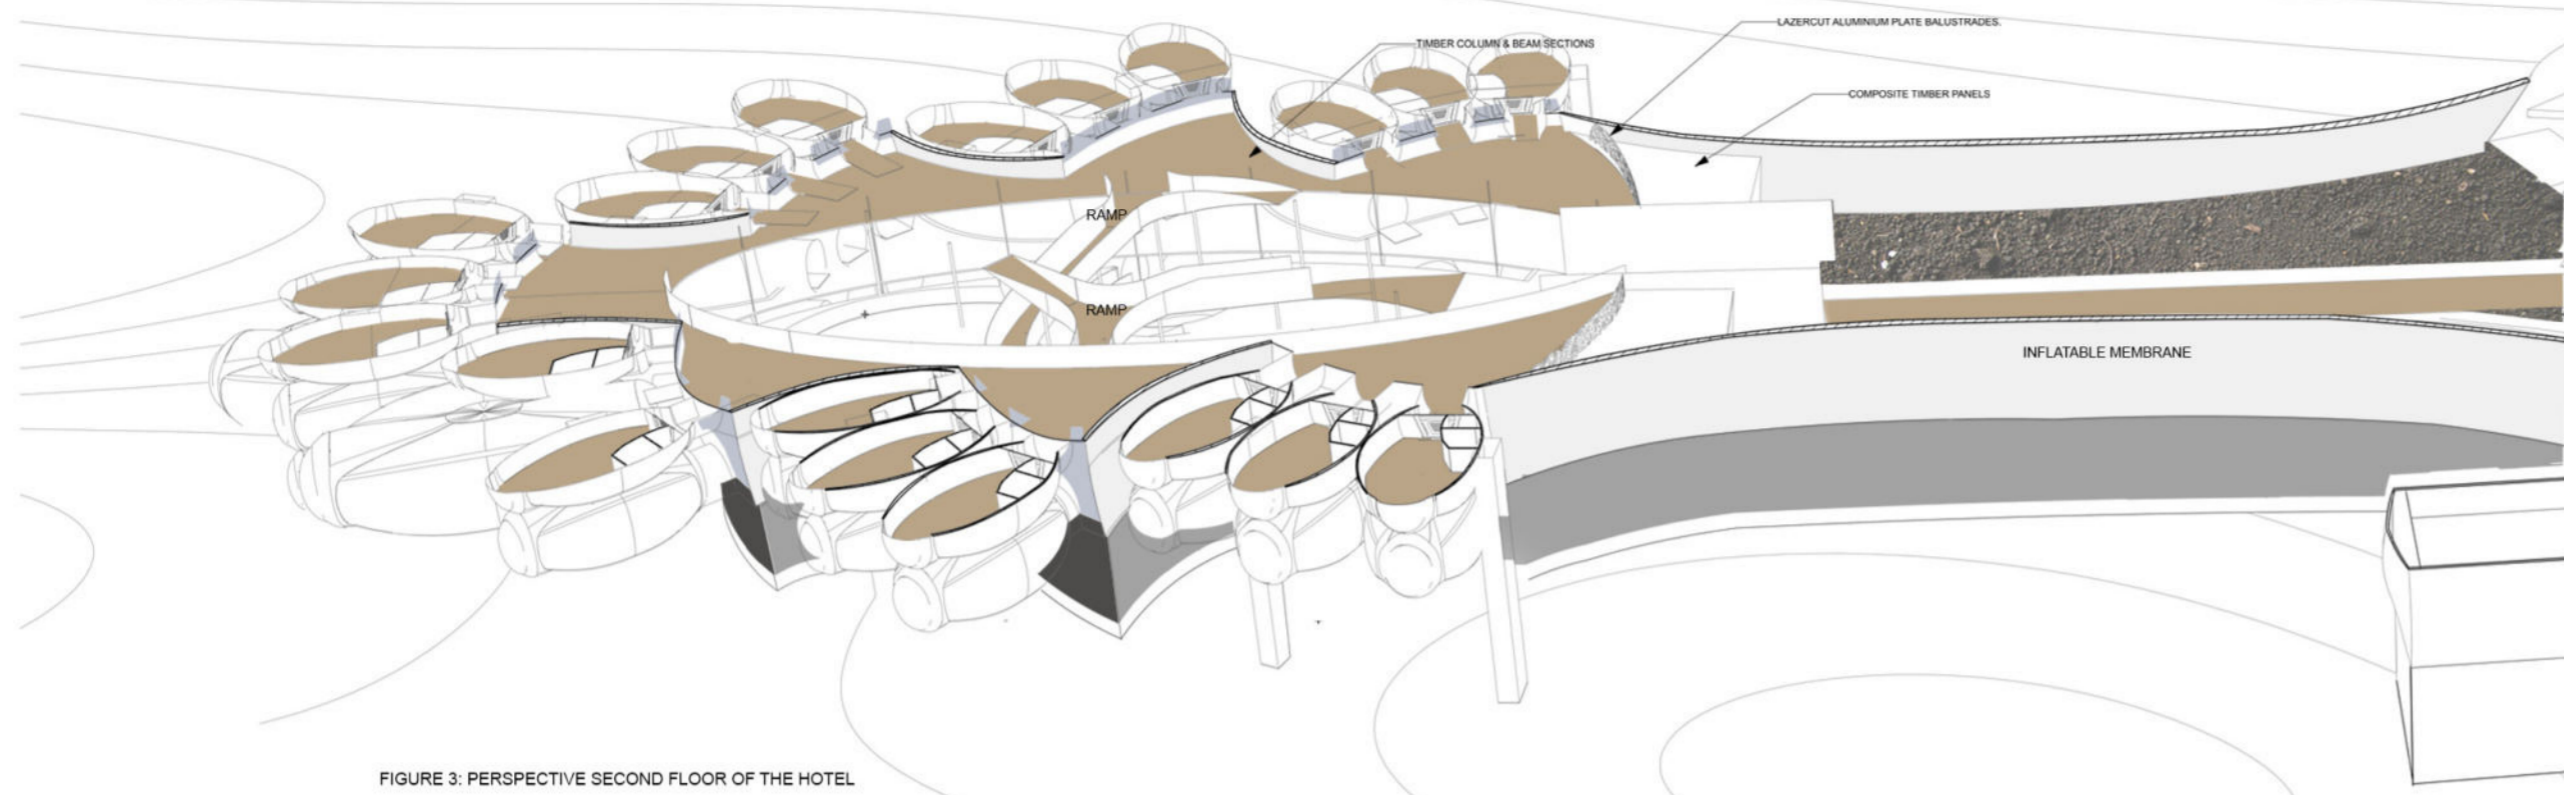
PERSPECTIVE SECOND FLOOR OF THE HOTEL
